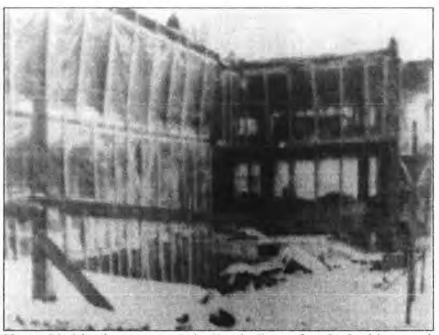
Plastic cocoon on the Brady Street façade, looking south (Davenport Democrat, February 2, 1958)
